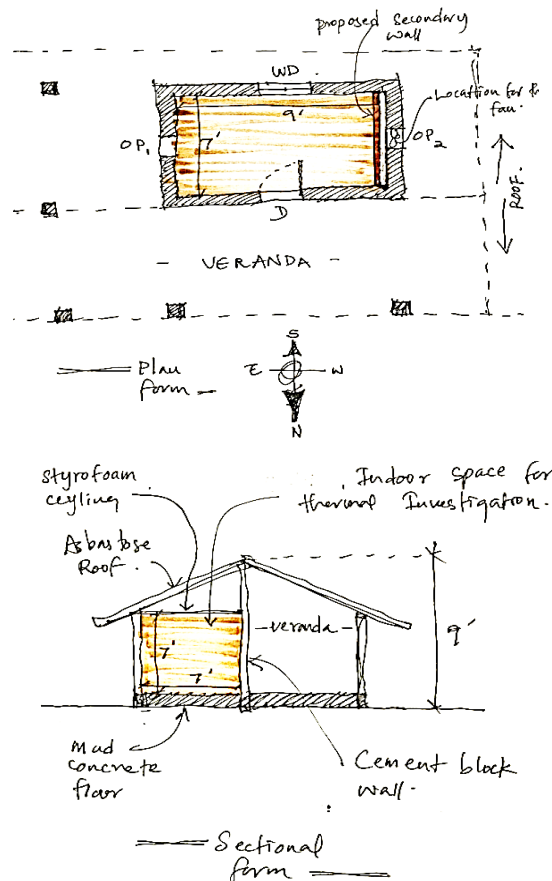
Sketch plan form and the sectional form of the prototype house
